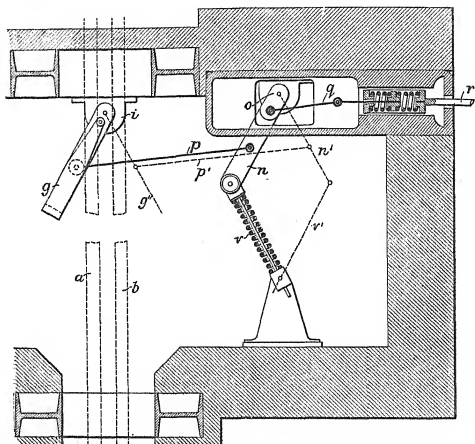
Plan of Siemens-Schuckert combined slot and rail point.
